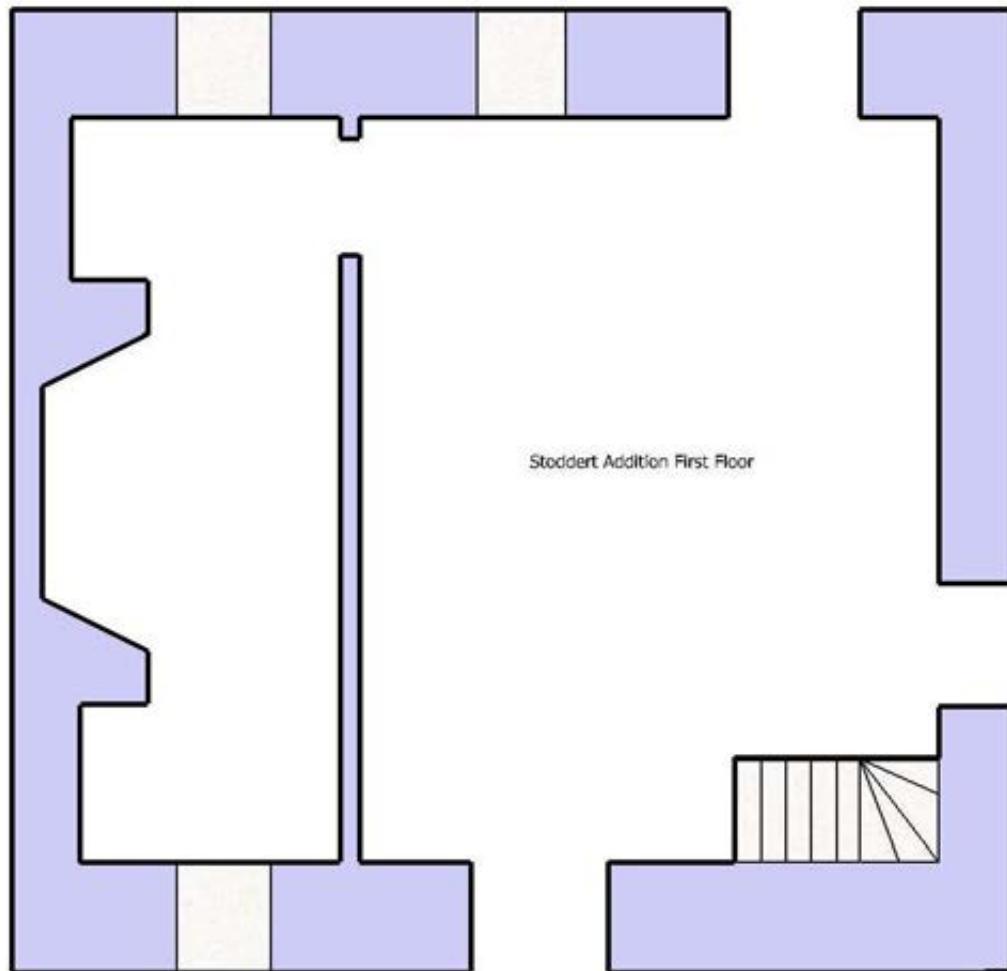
Plan showing the first floor of the Stoddert addition. The fireplace is on the north wall. Drawing by Kathleen Manicke.
